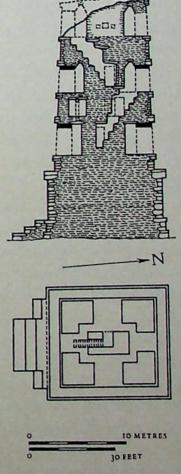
Palenque, Palace tower, sixth century. Section and plan
